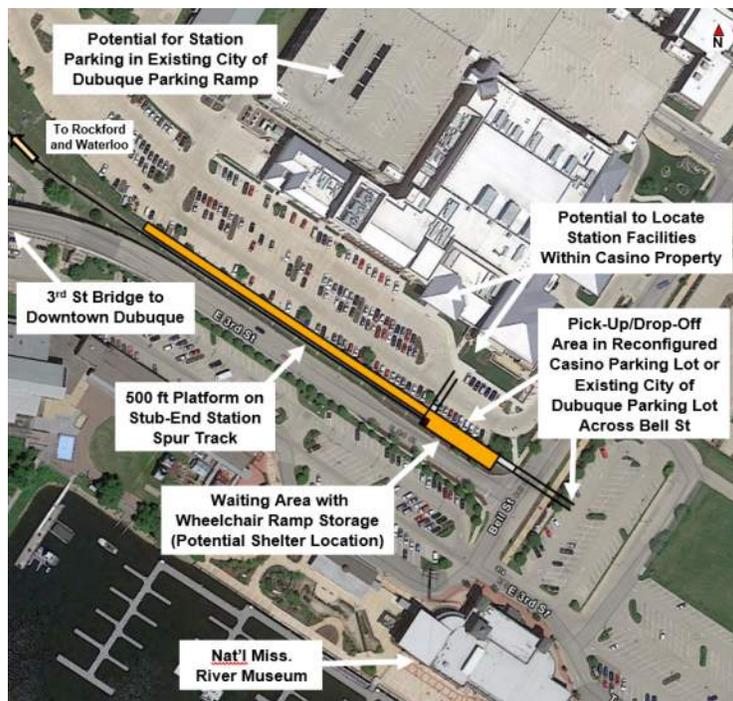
Dubuque Station – 3rd Street Spur alternative conceptual layout
